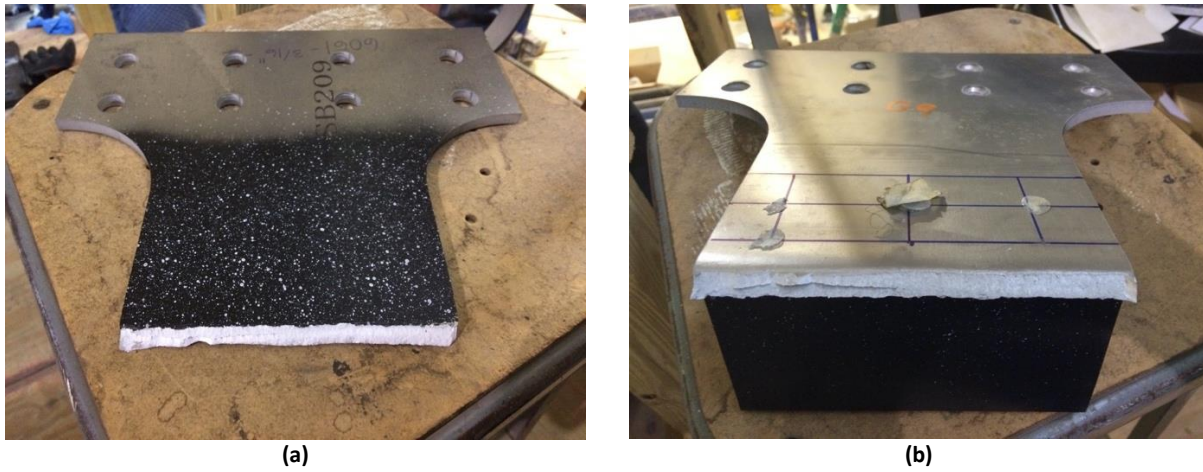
Specimen D1 Showing Failure at the Weld Toe
